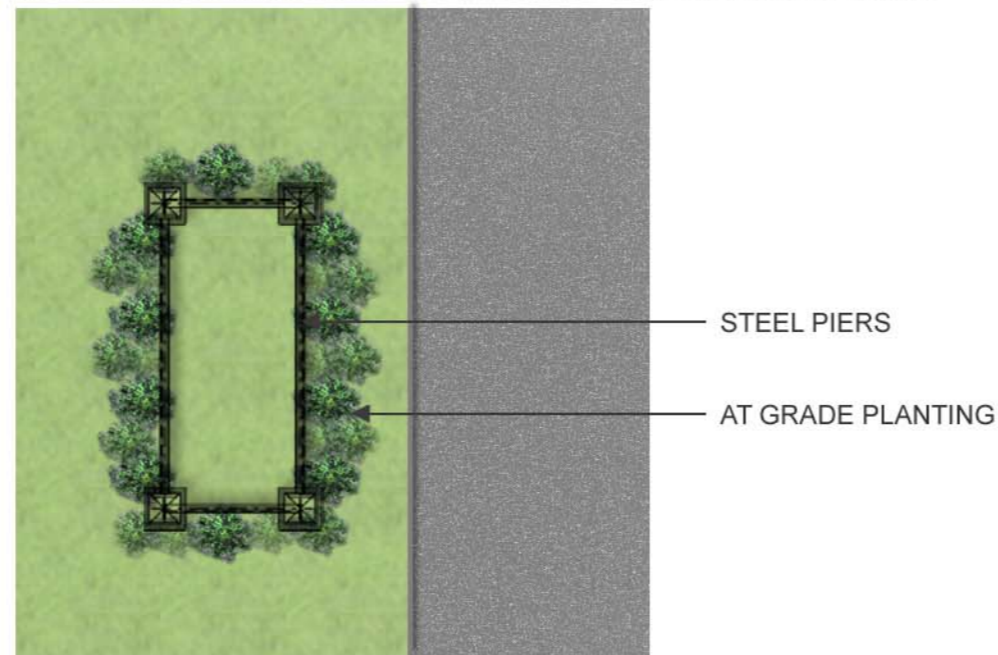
/3.11E - 1.7 PROPOSED LANDSCAPE WORKS FOR THE PIERS
